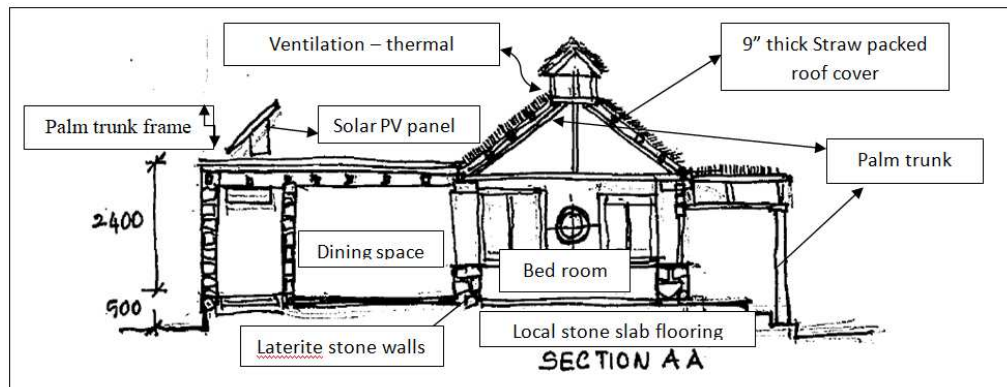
Cross Section of Rural Dwelling Unit Showing a Few Components
